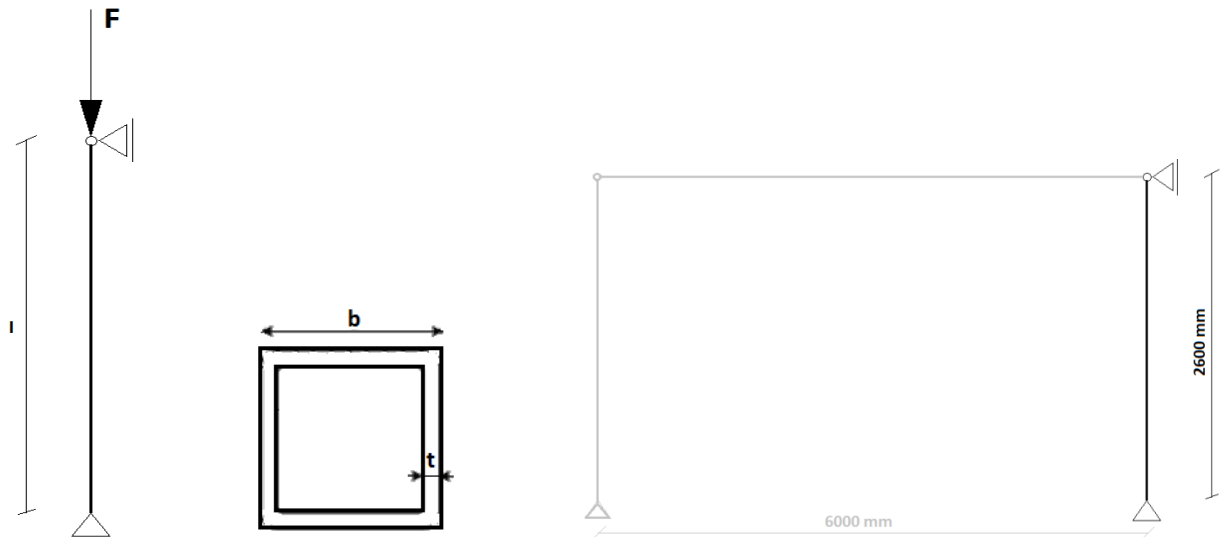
Column which will be calculated in the hand calculation and a schematization of the floor against the column.
